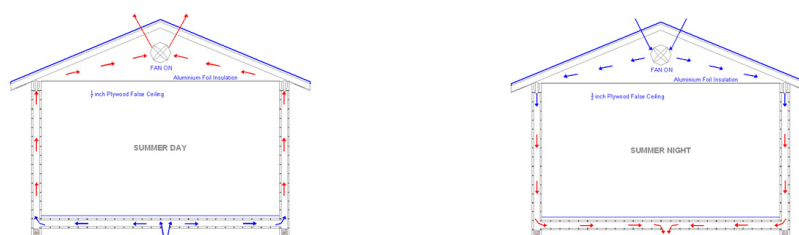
Example of cooling of building envelope by flushing away heat from hollow walls and attic using a small bi-directional fan
